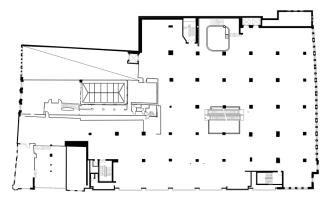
2nd floorplan of Leiden (made by building scale group).
